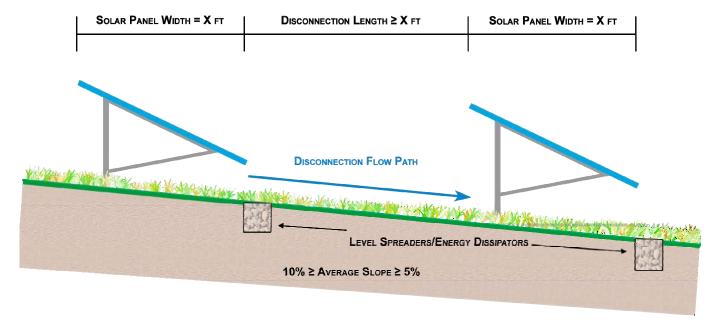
Typical Installation – Slope ≥ 5% but ≤ 10%
